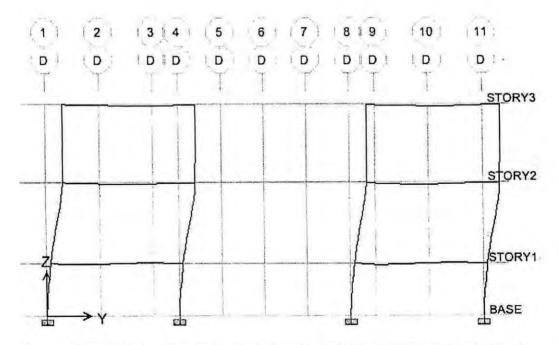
Deflected Shape of a typical cyclone shelter built by Grameen Bank
